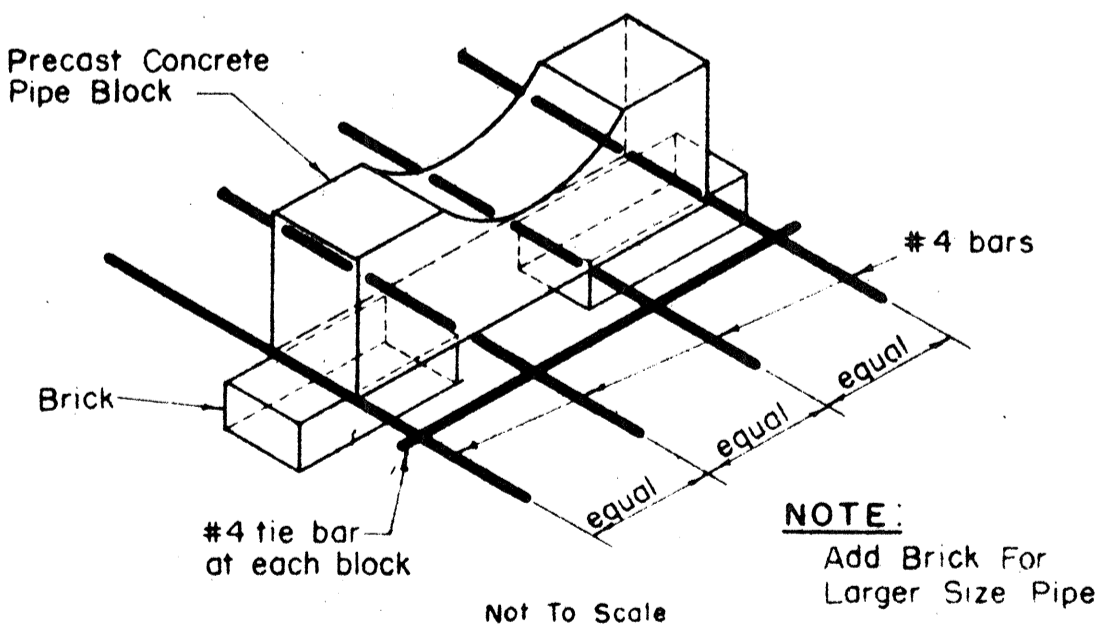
DETAIL OF PRECAST CONCRETE PIPE BLOCK
